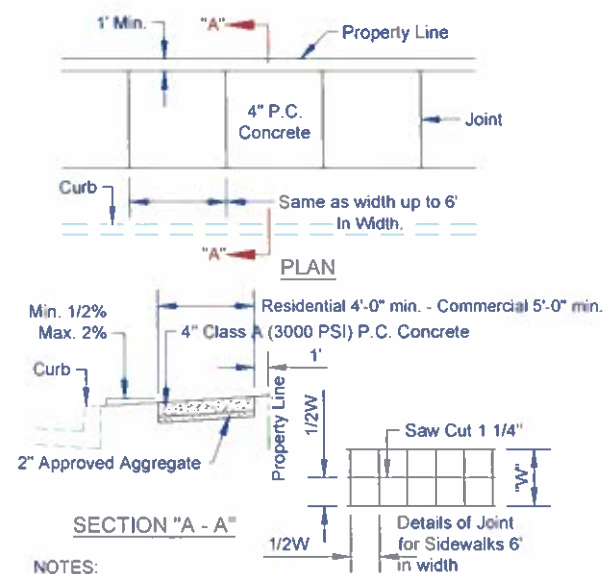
DETAILS FOR SIDEWALK LOCATED AT CURB
